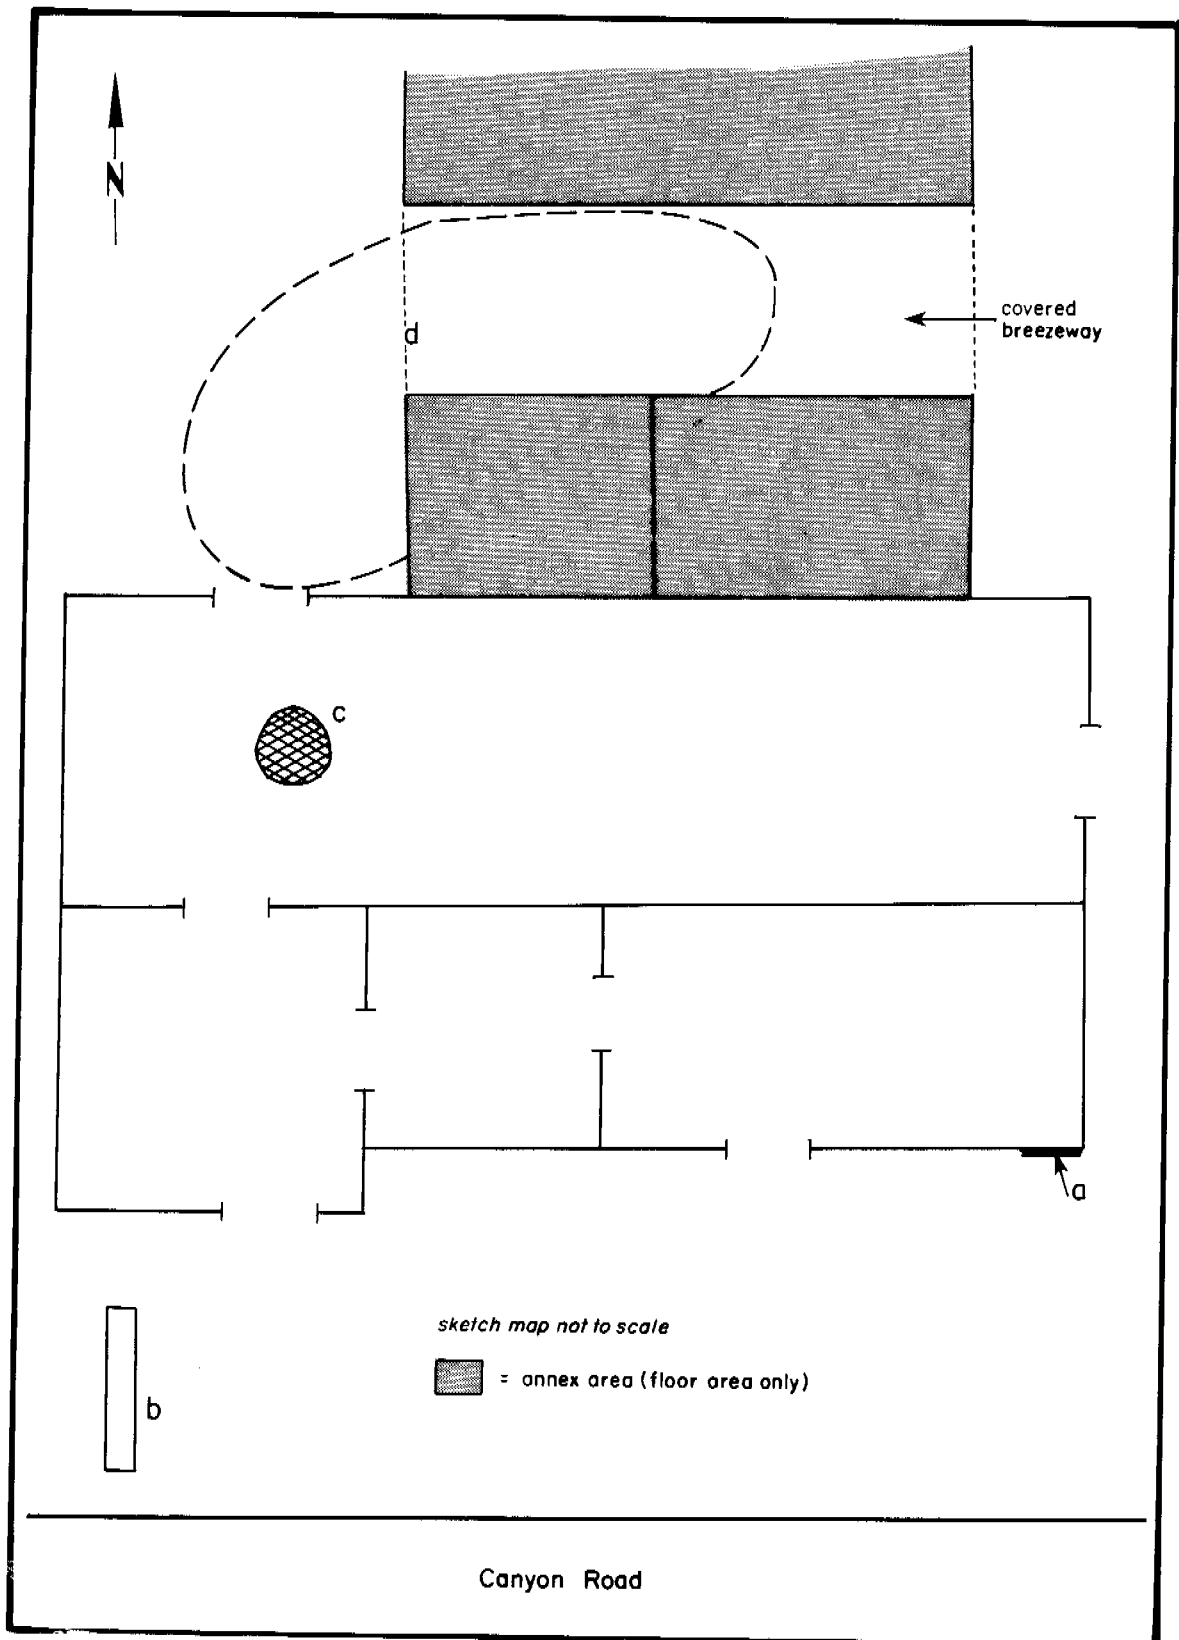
Site map sketch, 1985-86 renovation; (a) plaque from the Historic Santa Fe Foundation; (b) utility trench; (c) pit under the floor of the old adobe section suggests the position of the passageway between the Juan José Prada and Gorman quarters; (d) breezeway trash site.
